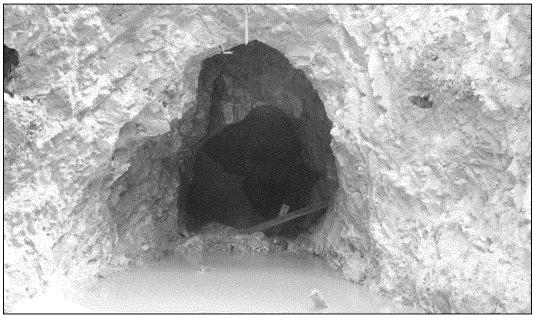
Photograph showing the Gold King Mine Level 7 New Adit on August 16, 2015, after an excavator was used to reach inside the mine opening and remove the timbers. Note piles of debris from partial roof collapses inside the adit.
